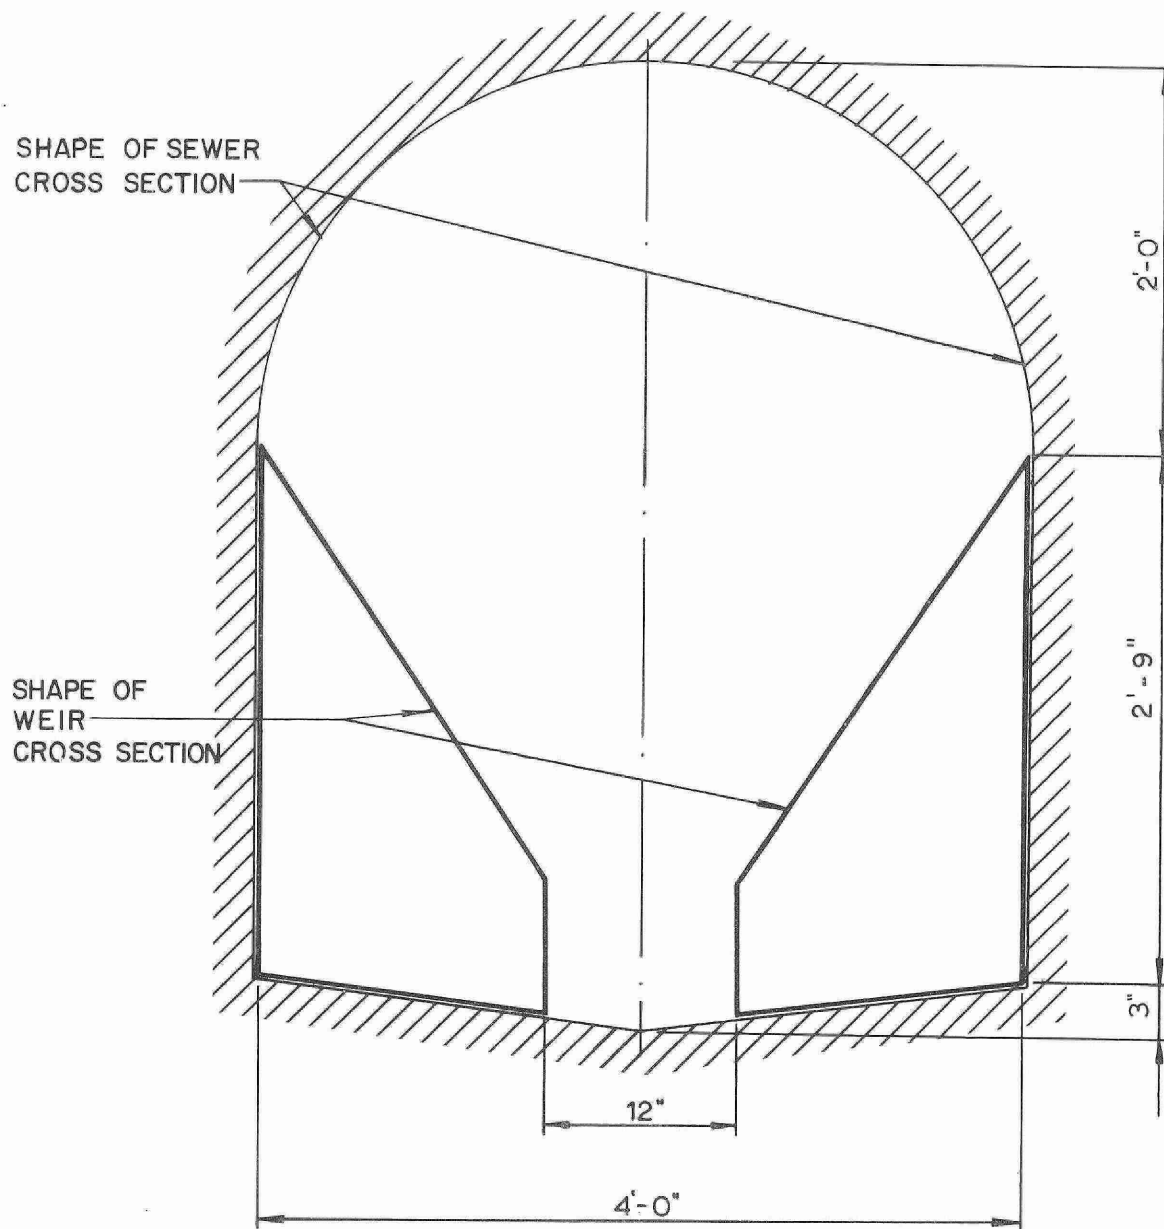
SCHEMATIC OF SEWER CROSS SECTION SHOWING WEIR CONSTRUCTION
